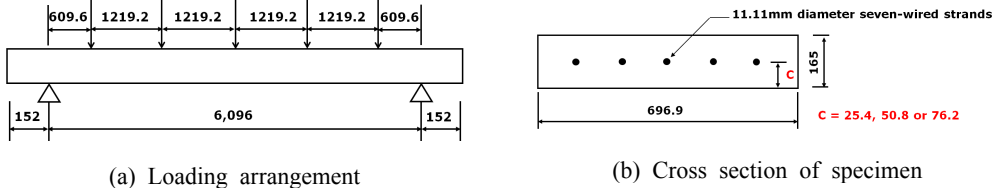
Specimen details for five-11.11mm tendons and 6,096mm span.
